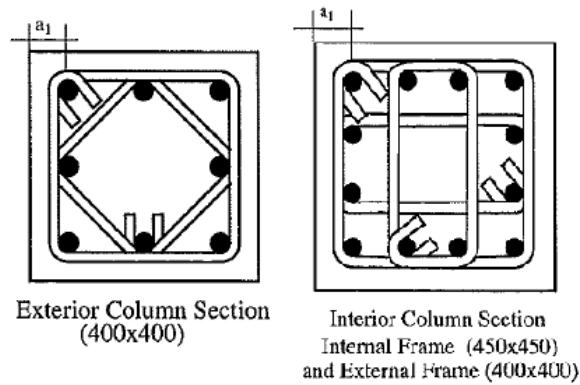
Columns cross section (from. Negro P. et a, 1994)
